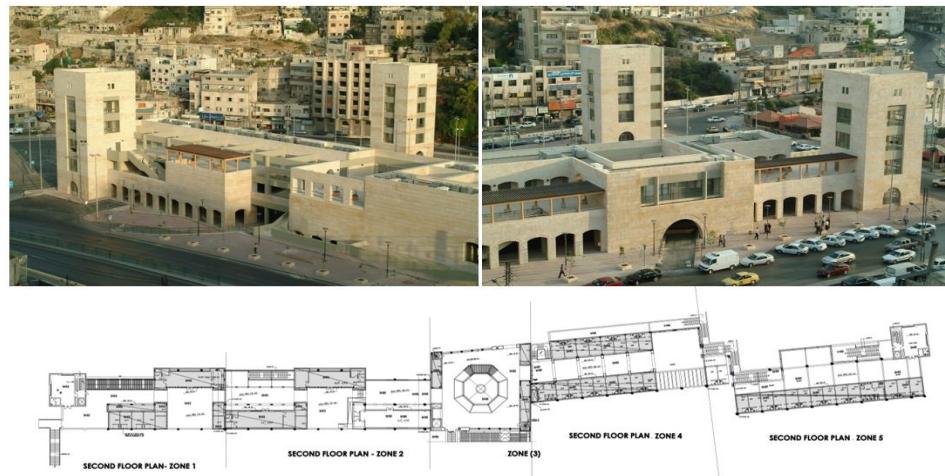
Architectural Floor Plan and Elevation Views of the Raghadan Tourist Terminal, Source: (Consultants, 2006).
